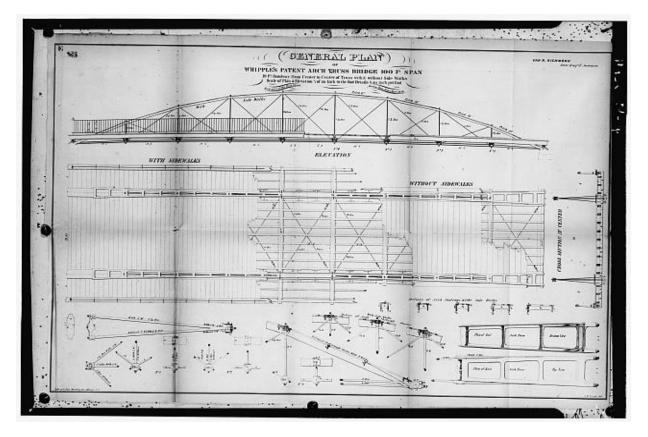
Squire Whipple's Patent Arch Truss Bridge—100 Ft. Span. Approved for Erie Canal of New York, 1859. The 100-ft spans built in 1859 for Little River, Sans Bois Creek, and Poteau River Bridges for Beale Wagon Road were like this design, without the pedestrian sidewalks.
